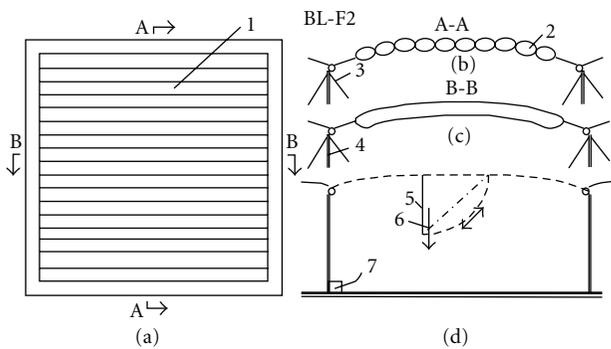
Design of AB Blanket section. (a) Typical section of blanket (top view); (b) cross section A-A of blanket; (c) cross section B-B of blanket; (d) typical section of AB blanket (side view). Notations: (1) part of Blanket; (2) light lifting gas (for example: methane, hydrogen, or helium); (3) bracing wire (support cable); (4) tubes for rain water, for lifting gas, signalization and control; (5) cover of windows; (6) snow, ice; (7) hydroelectric generator, air pump.
